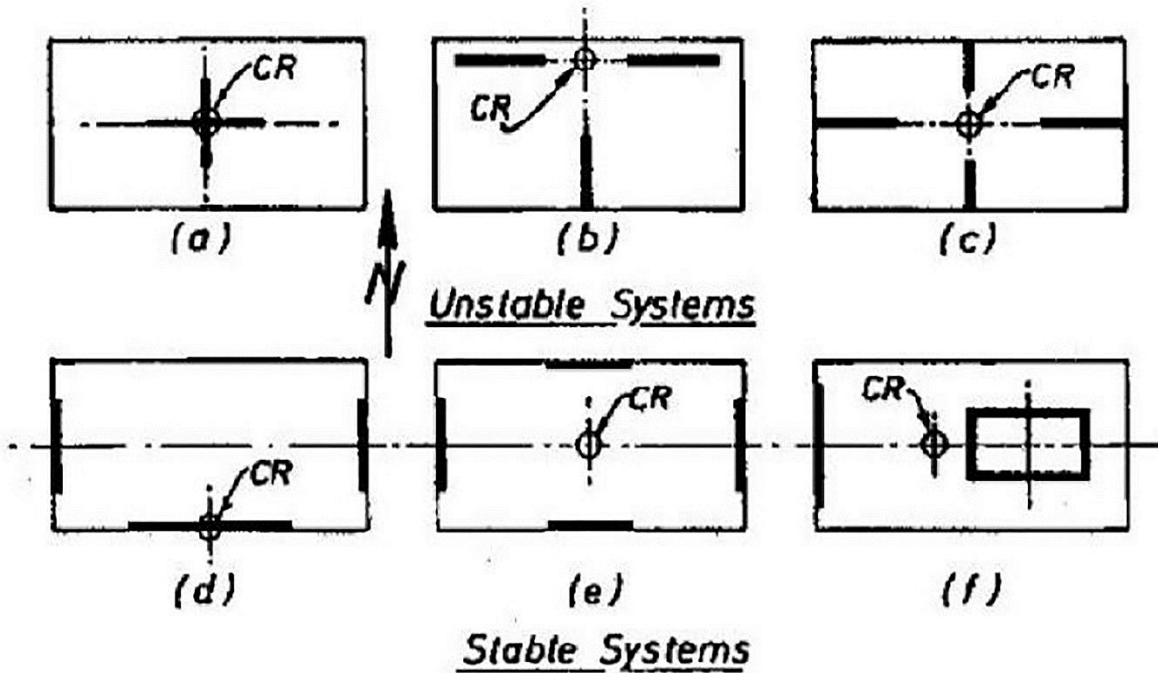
Wall type arrangements in hotels and apartment buildings [7]
